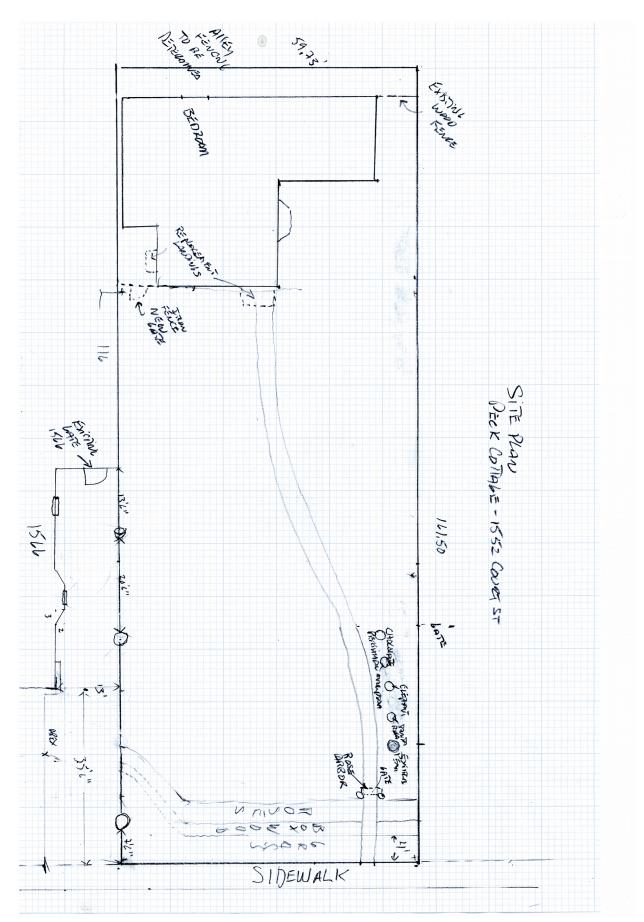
Site Plan For Peck Cottage - 1552 Court Street
